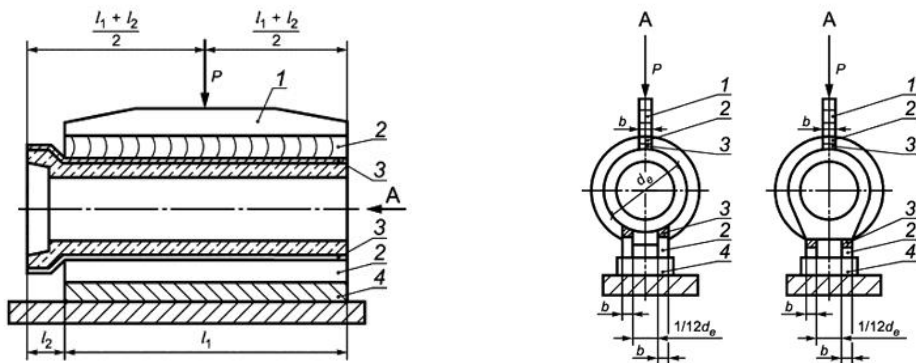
Loading scheme [21]: 1 – traverse; 2 - wooden beams; 3 – rubber gaskets or cement-sand mortar; 4 – basement.
